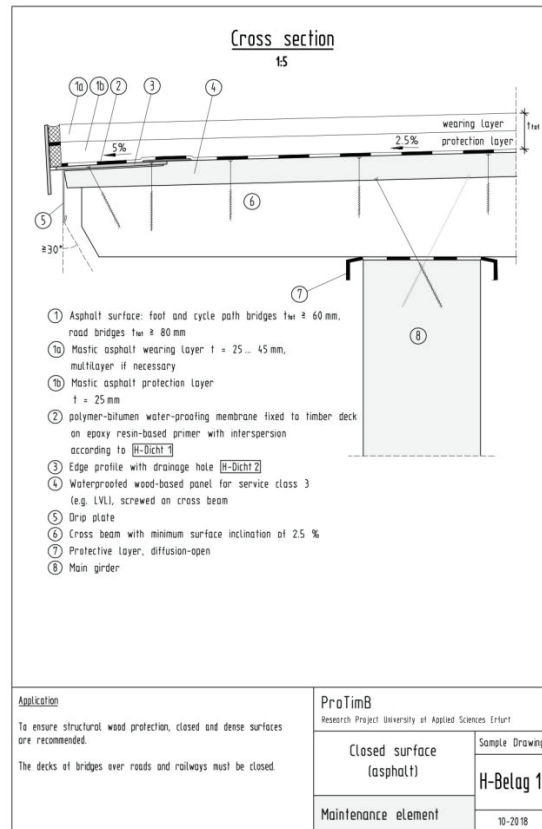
Sample drawing H-Belag 1 showing the surface layers and the sealing
